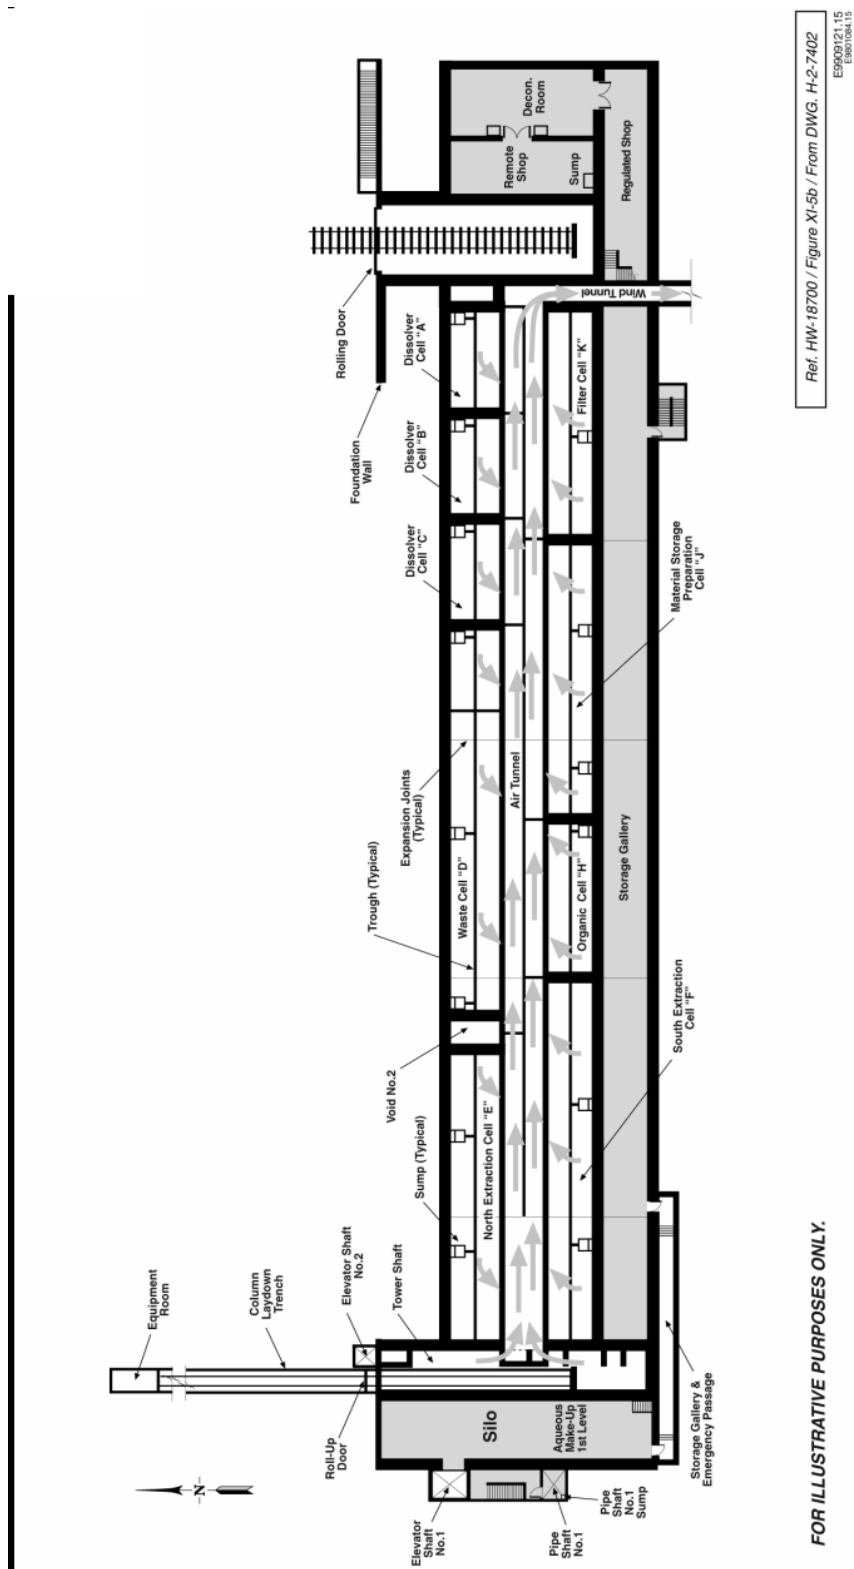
202-S Canyon Cell Floor Level Plan View.
